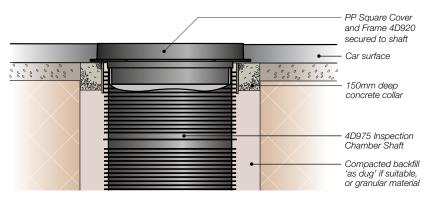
Installation detail Class A15 – non adopted areas subject to occasional loading up to 15kN (up to 50kN when supported with a concrete plinth). For adopted locations or heavier loading up 125kN, a B125 cover should be used.
